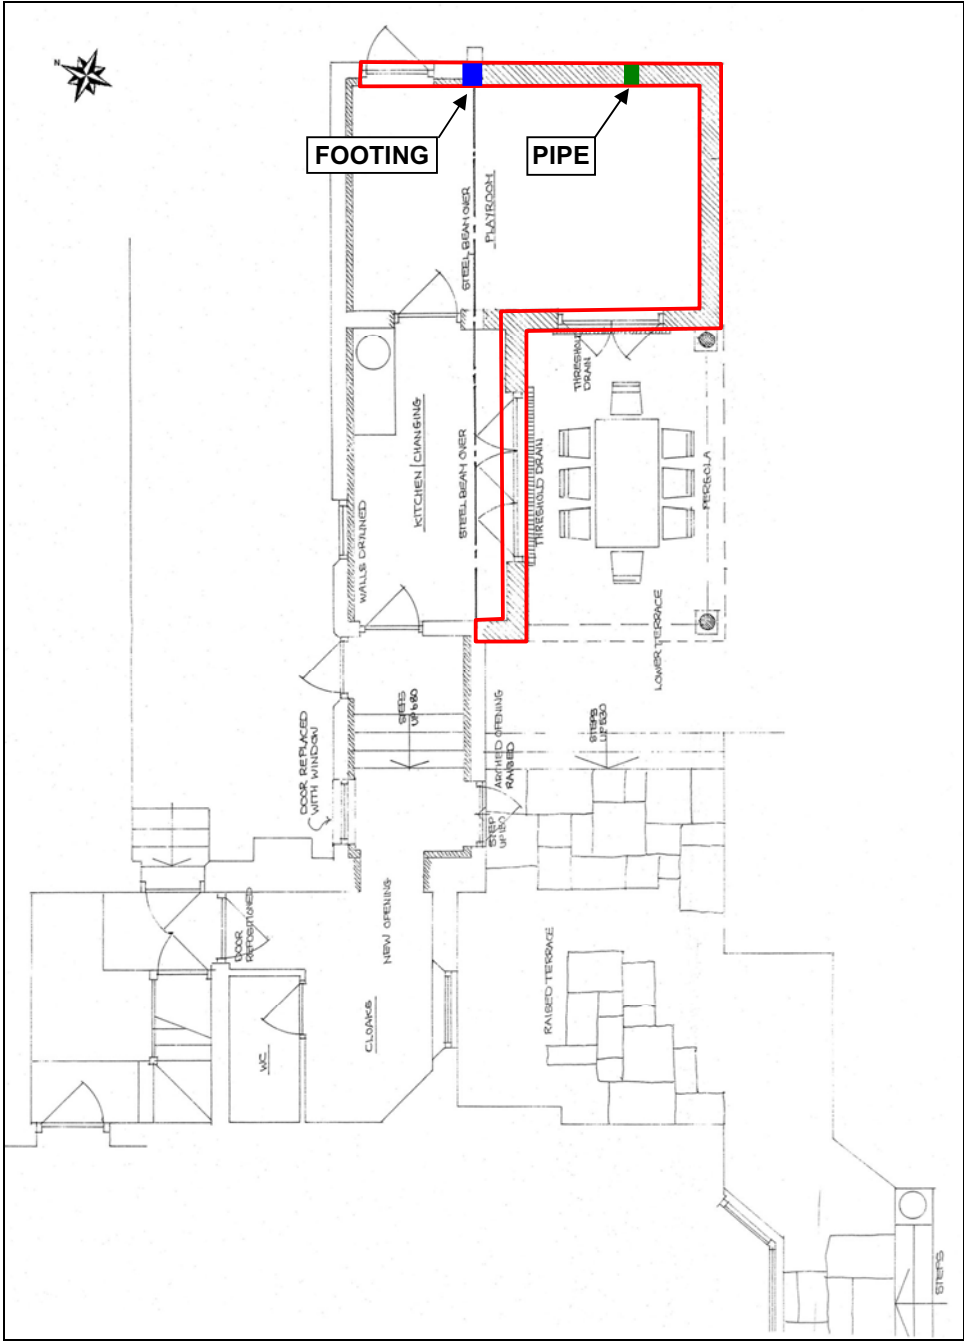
Proposed development plan, with footing trench outlined in red (scale 1:100)
